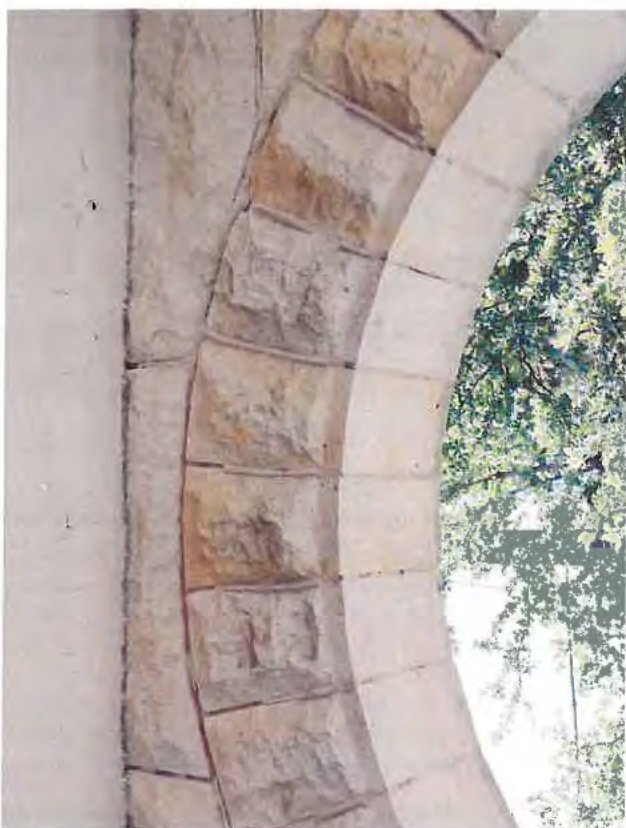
Eroded/cracked mortar joints at east arch of ground floor south portico.
